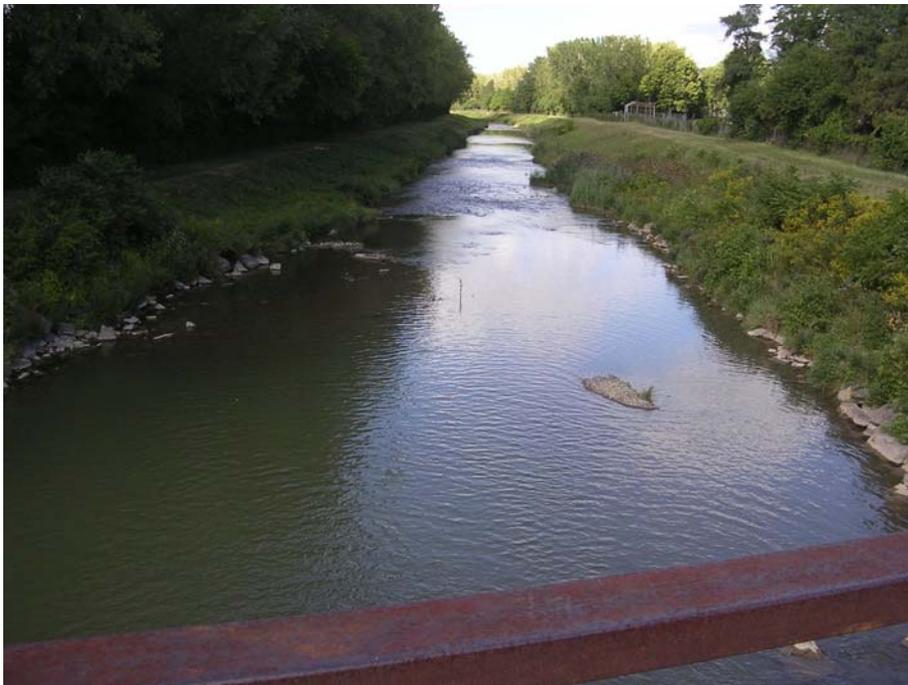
Channel looking downstream from Dorwin Avenue bridge - riprap on left and right banks covered with heavy vegetation.
